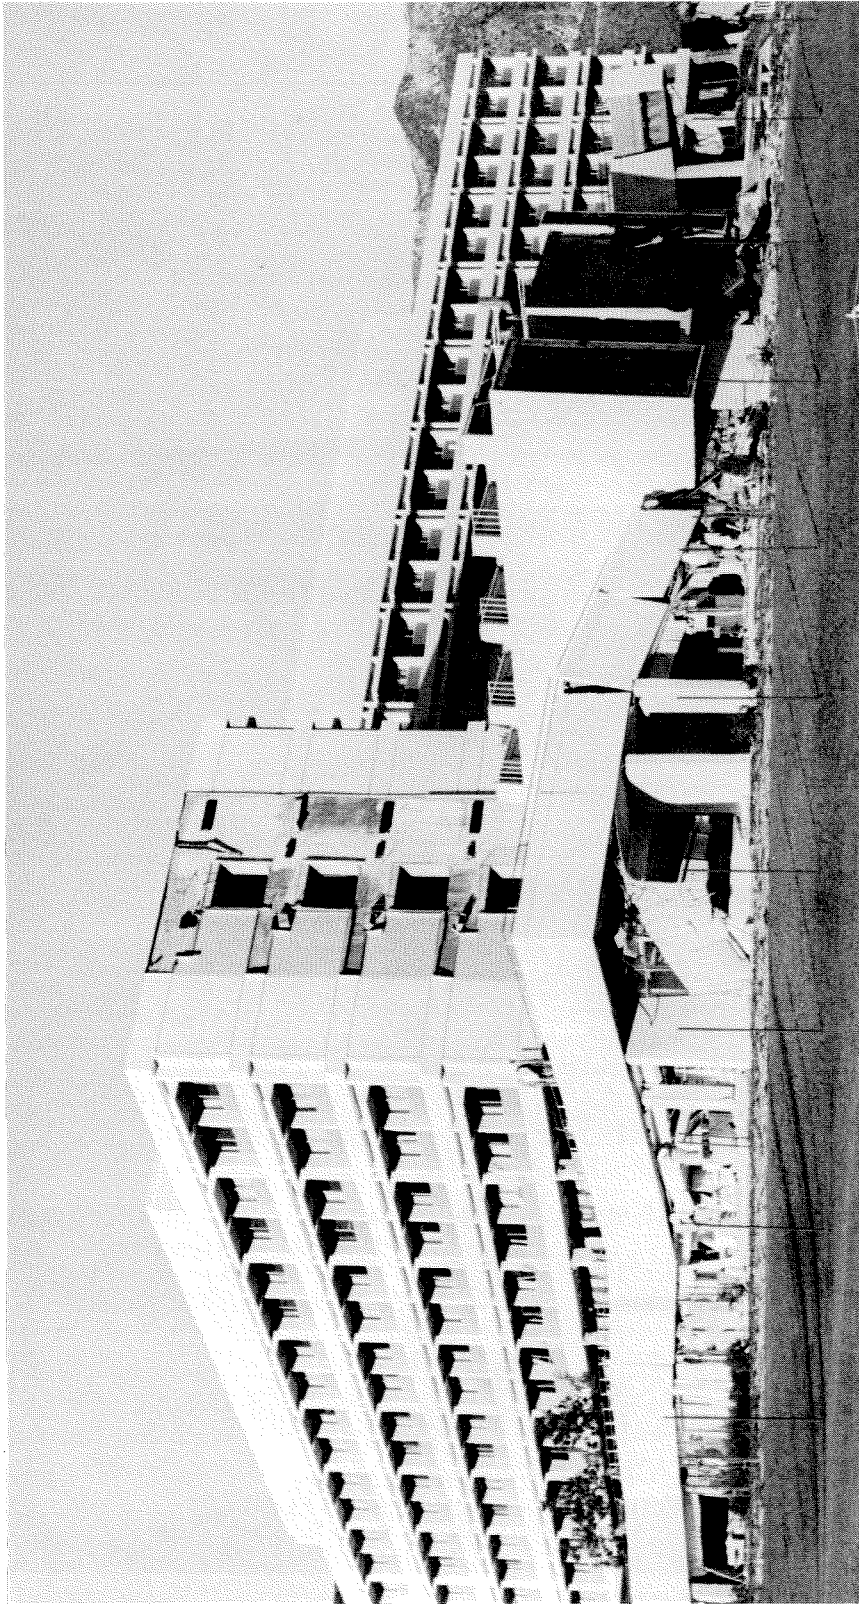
Olive View Hospital. South end of west wing. Stairwell has collapsed onto lowest story. What appears to be the first story when viewed from the south is the basement story when viewed from the north.
